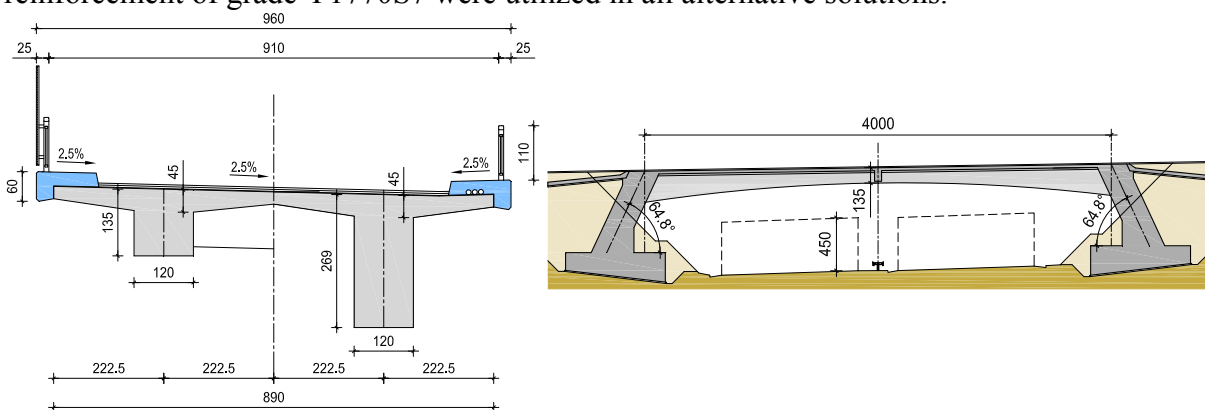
High strength concrete overpass – cross and longitudinal section of chosen solution
